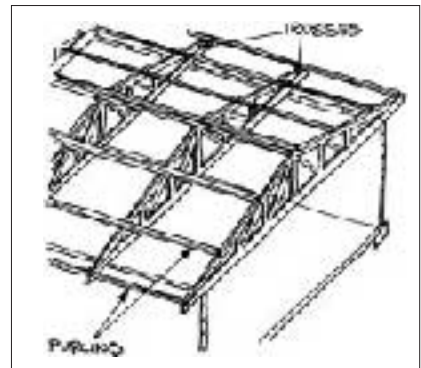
To create a slope over a flat-roofed building, contractors can install a sloped purlin framework.
